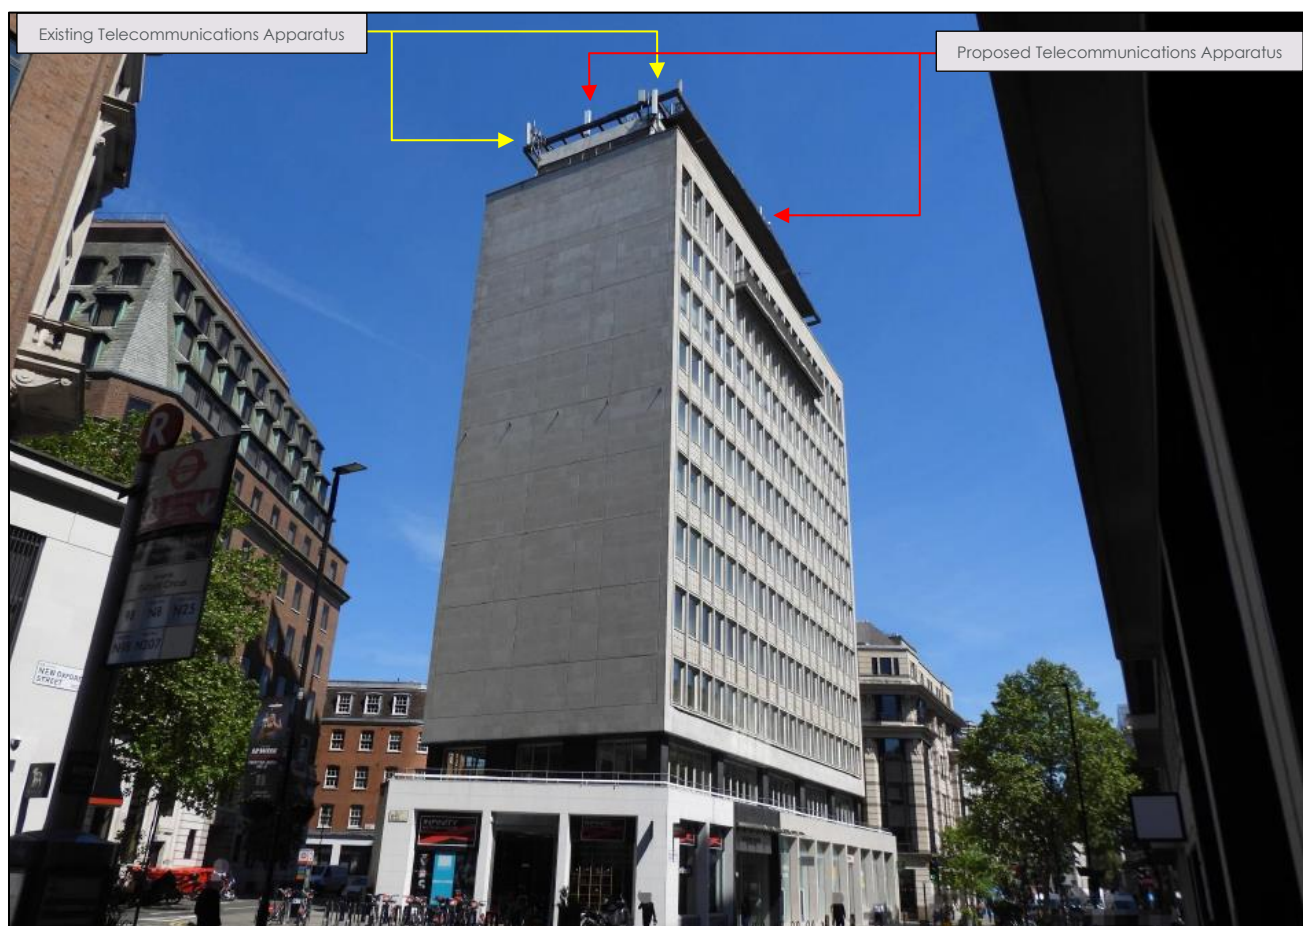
Streetview photomontage of the existing and proposed equipment on Holborn Tower
